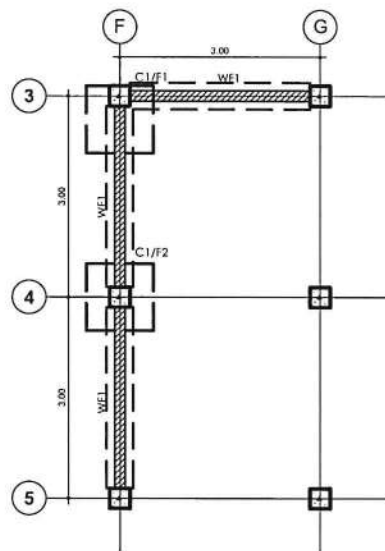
TYPICAL DETAIL OF BEAM BLOCK
